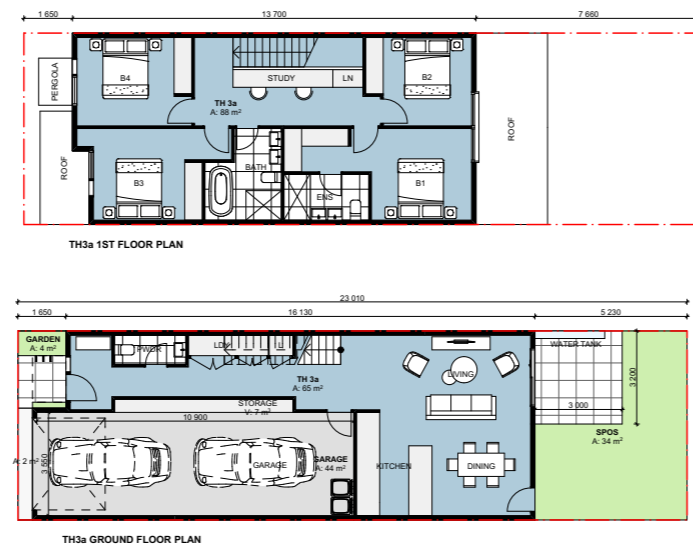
Townhouse Type 3a (Source: Plus Architecture)
